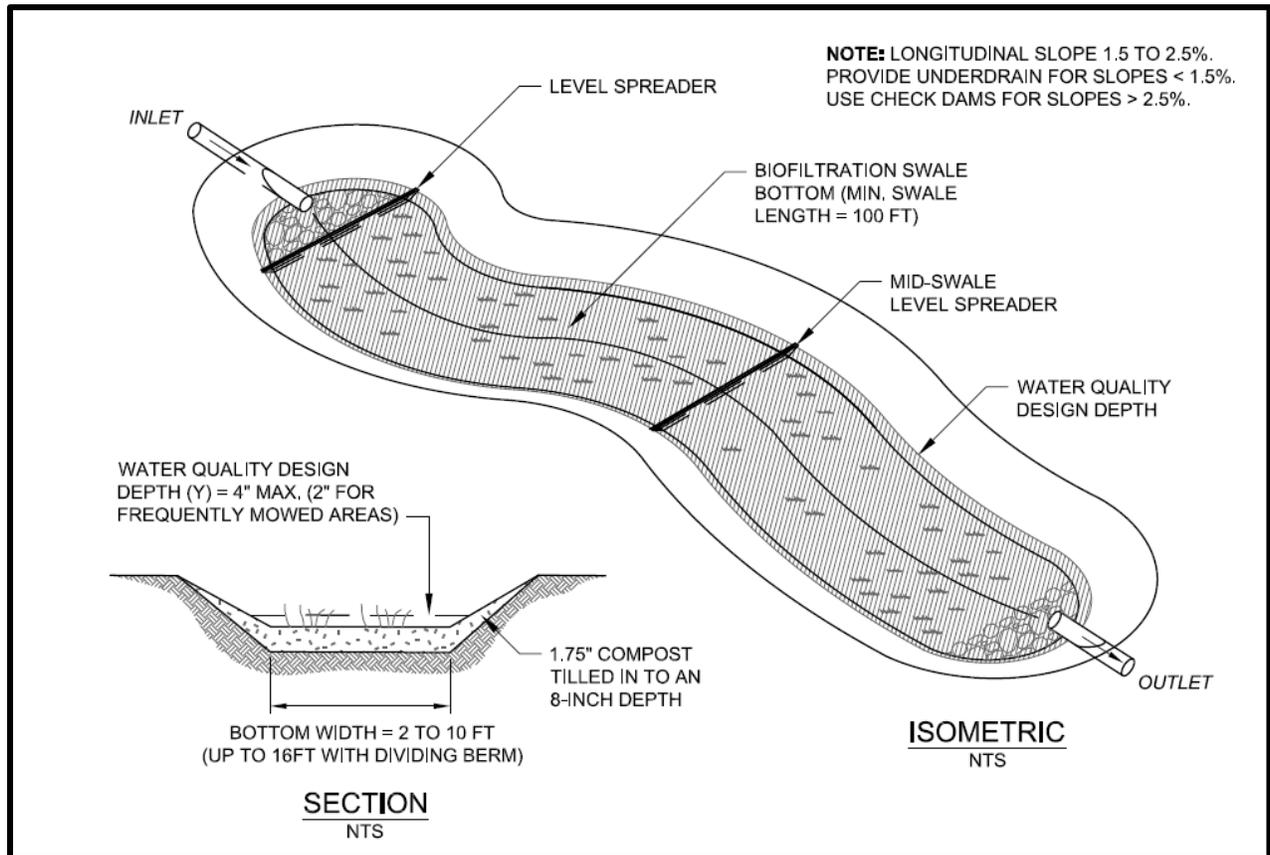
Biofiltration Swale Plan and Profile.
